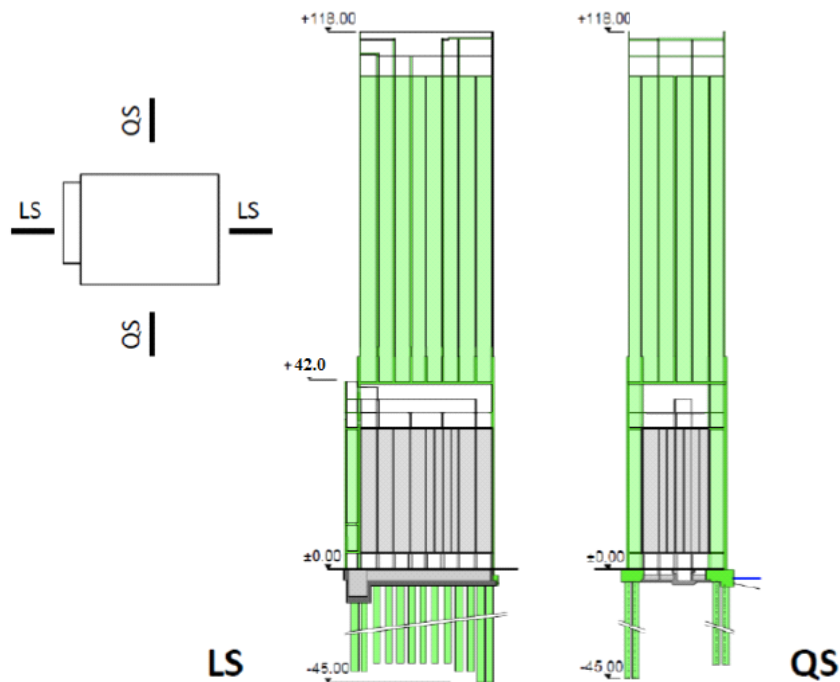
Cross section (elevation view) of existing and new silo (Grob 2016)
